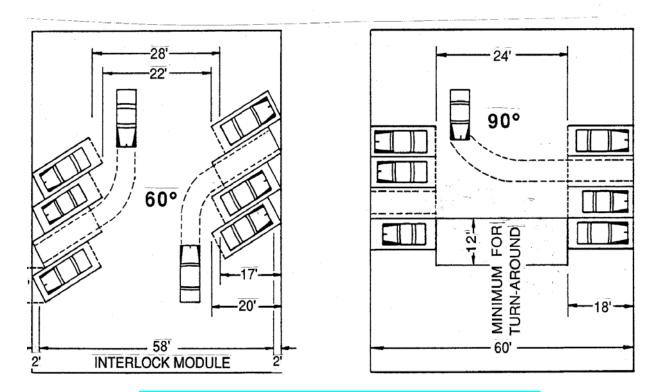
MINIMUM ONE-WAY PARKING DEPTHS
